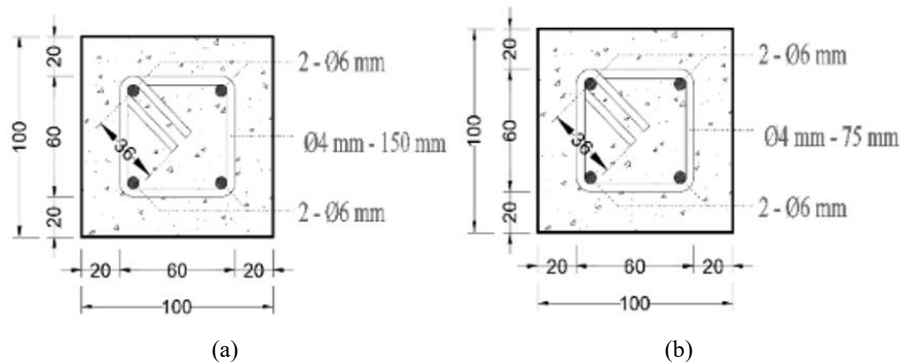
Cross-sections: (a) frame and diagonal bracing, (b) vertical link beam
